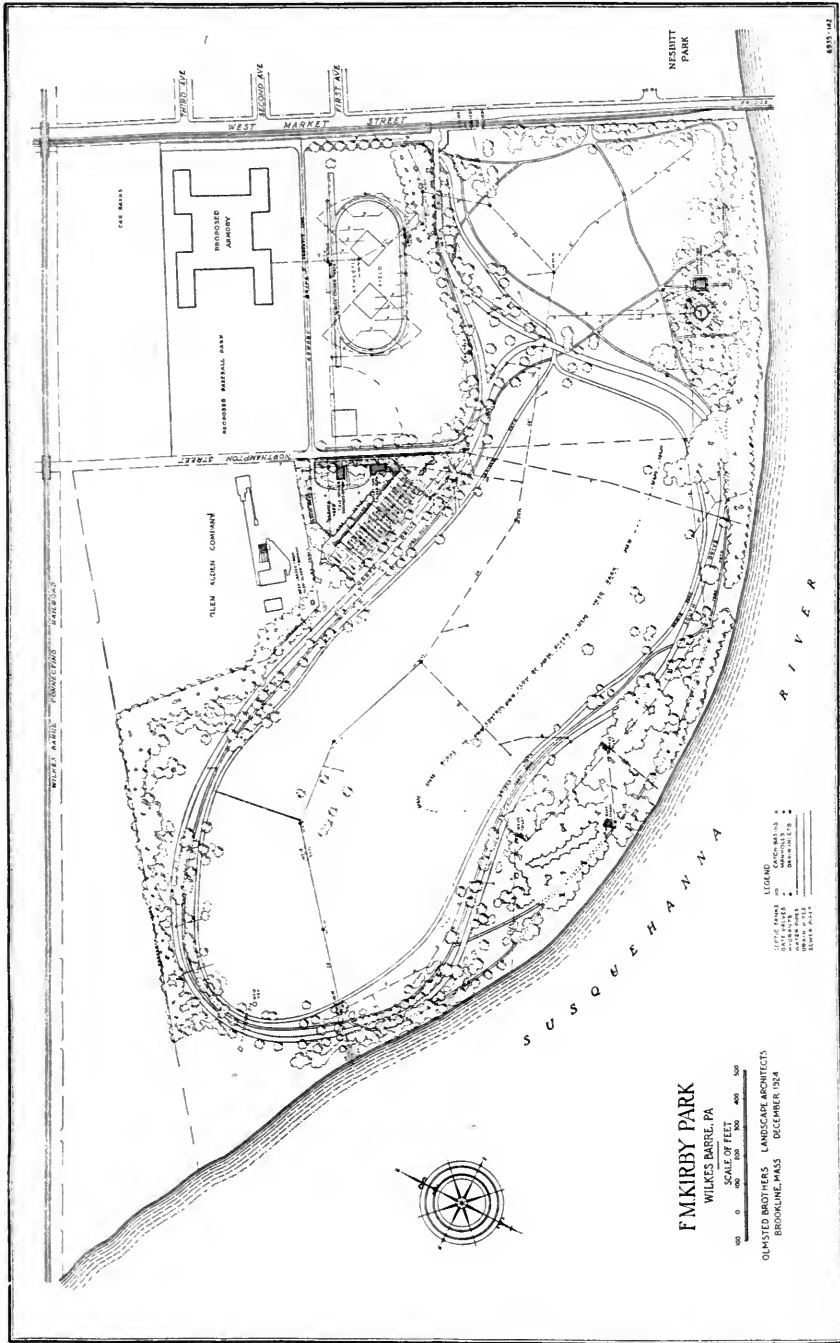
PLAN OF THE F. M. KIRBY PARK, WILKES-BARRE, PENNSYLVANIA
